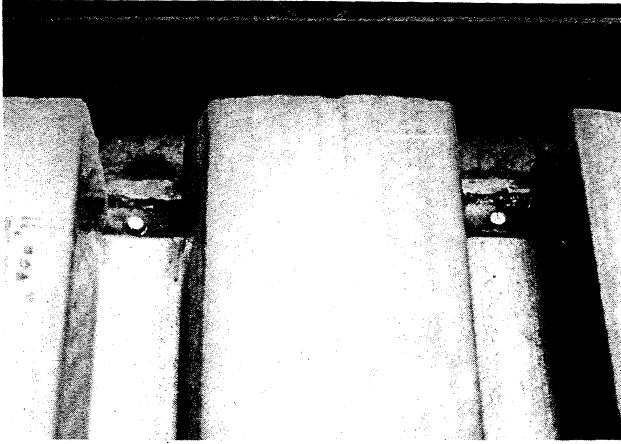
View showing the buckled panel at one of the connections. The connection is a flat, $1\frac{3}{4} \times 1 \times \frac{1}{8}$ in., welded to the frame.
